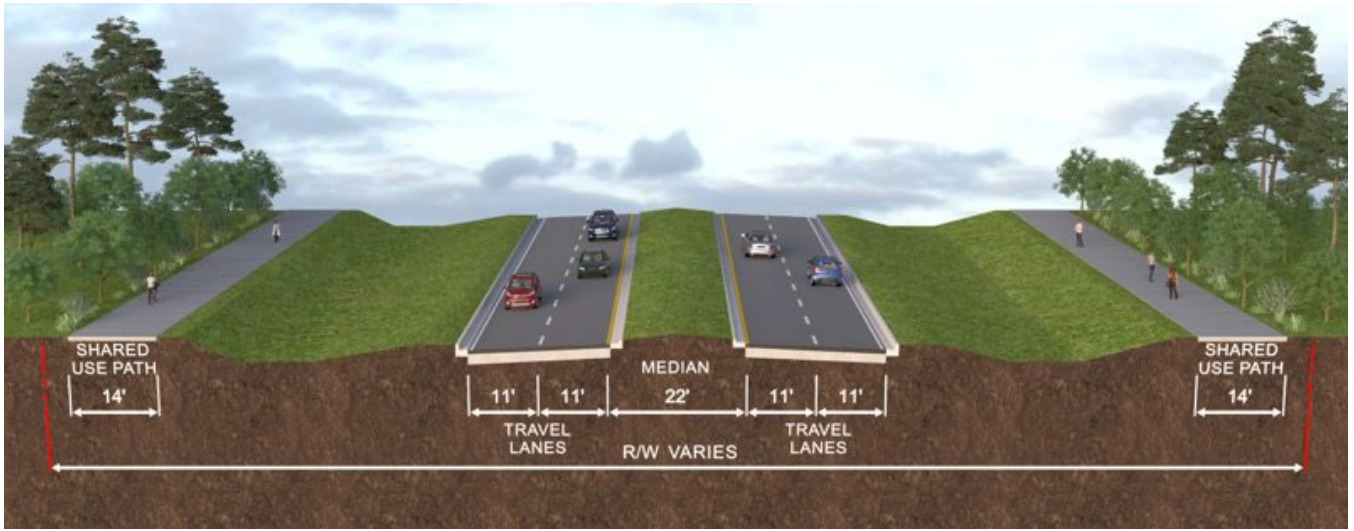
Segment 4 Typical Section (London Boulevard to Industry Road)
